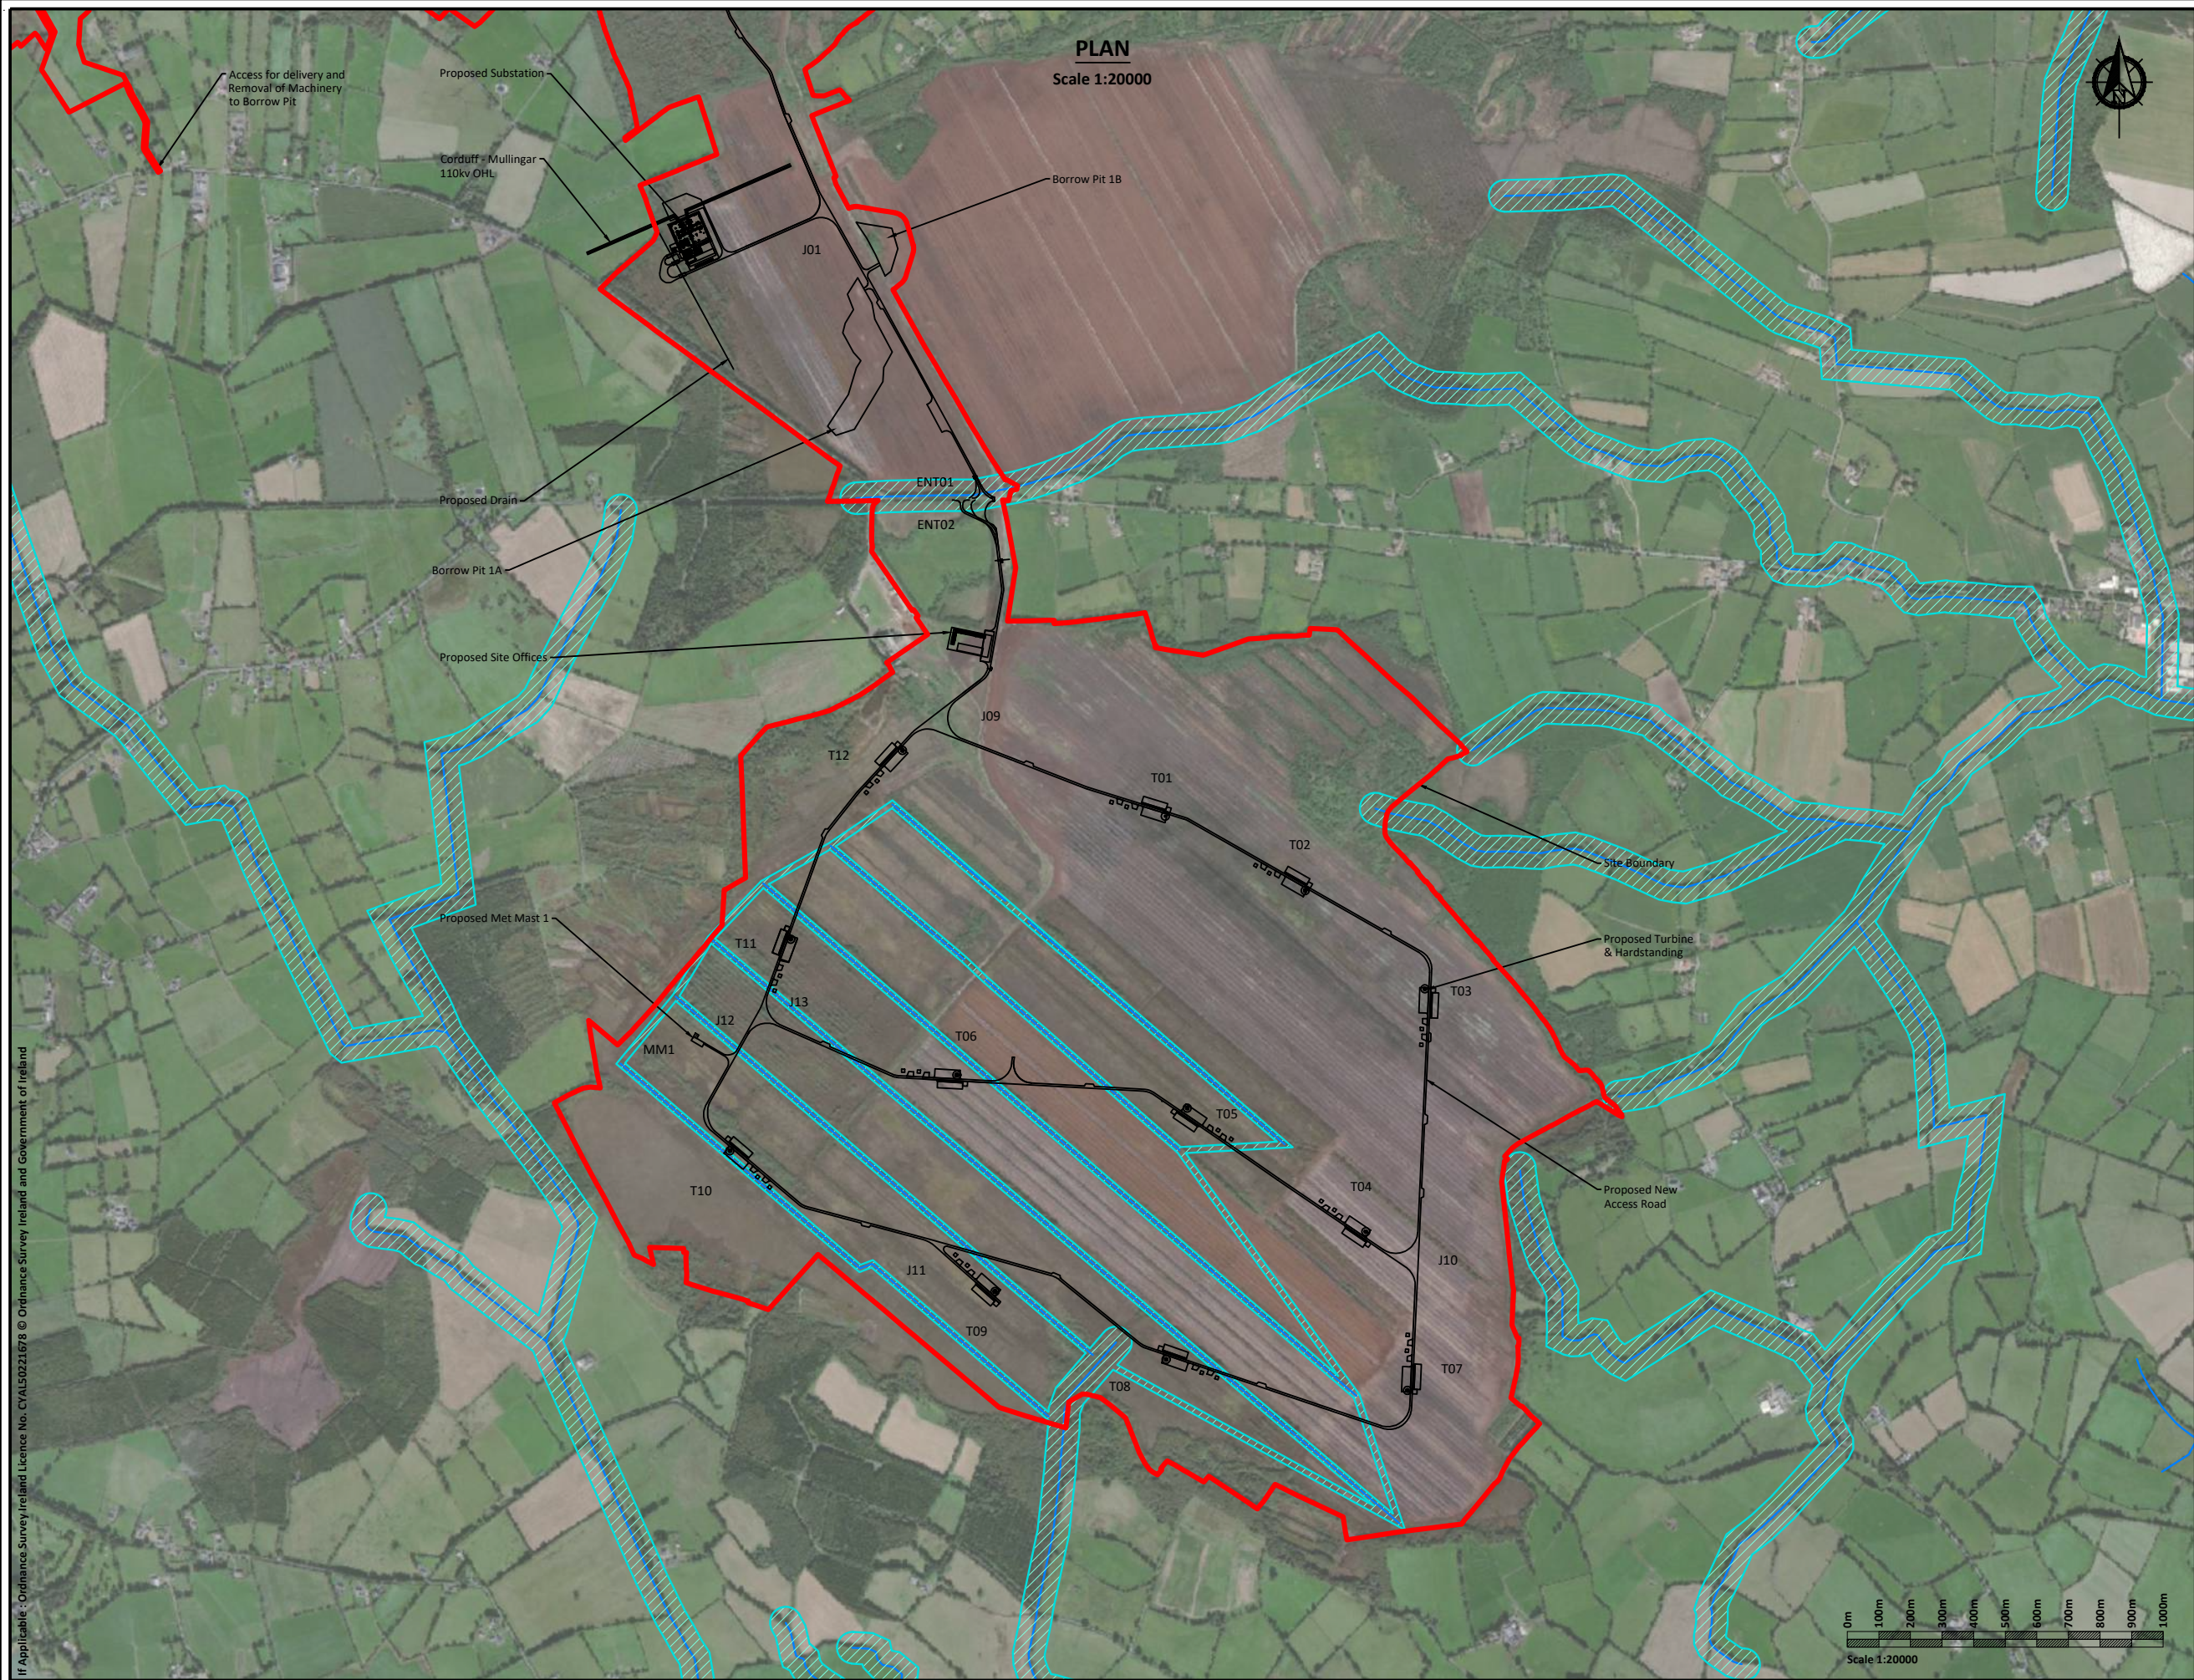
CONSTRUCTION BUFFER ZONE PLAN SHEET 1 OF 2
